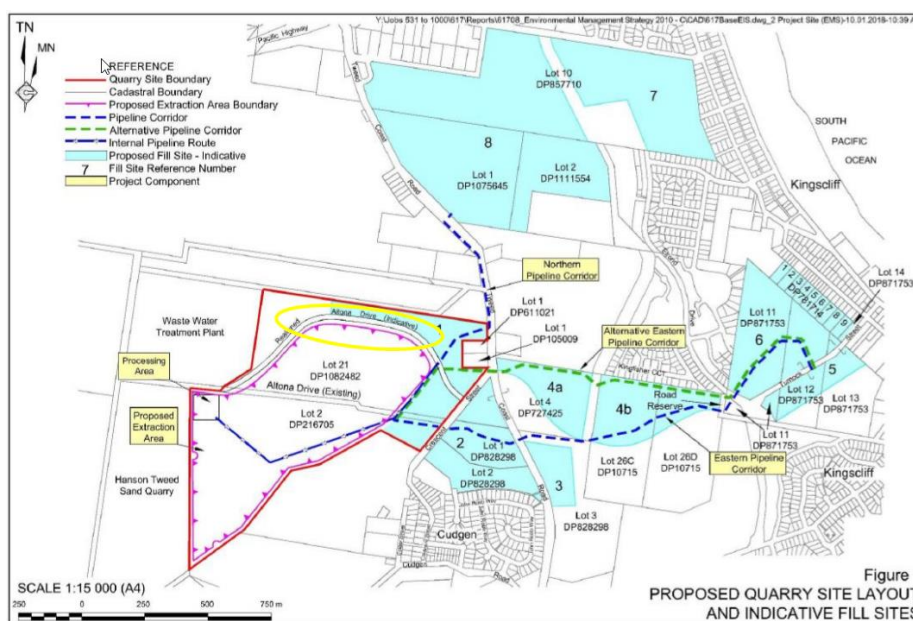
Approved site layout (approved 22 Jan 2019) under MP05_0103B – Altona Road circled in yellow
